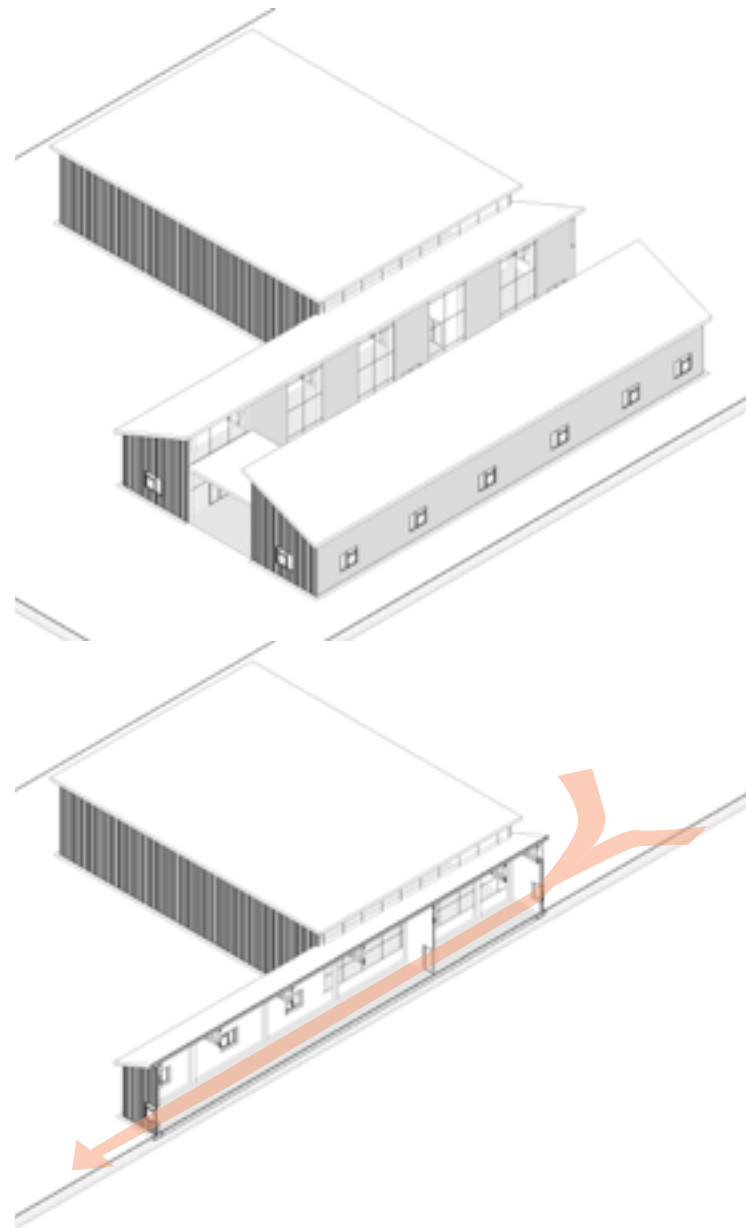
; Cross Ventilation of proposed timber community center in North Conway
